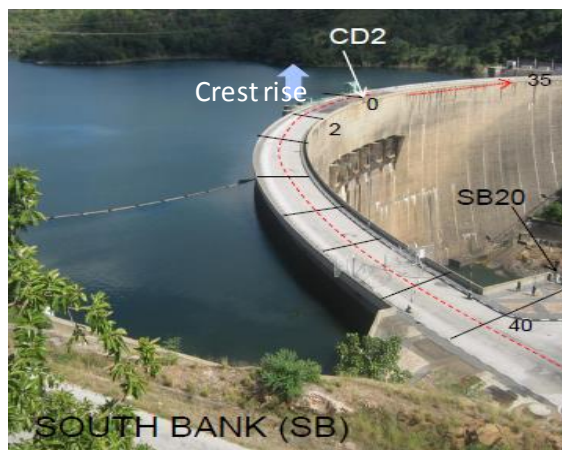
Photo showing dam crest sections with CD2 at 0 as center
